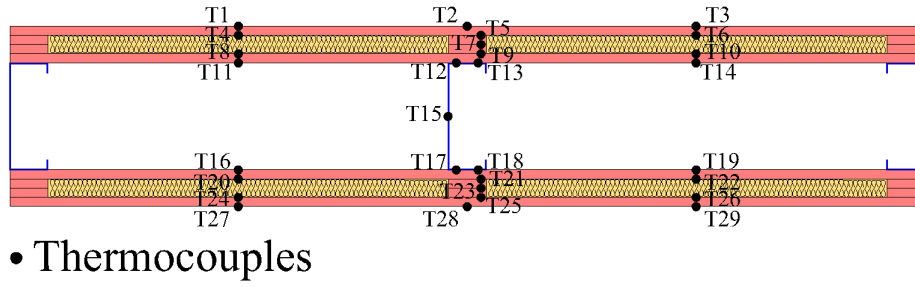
Cross section of wall specimen “S9” and “S13”.
